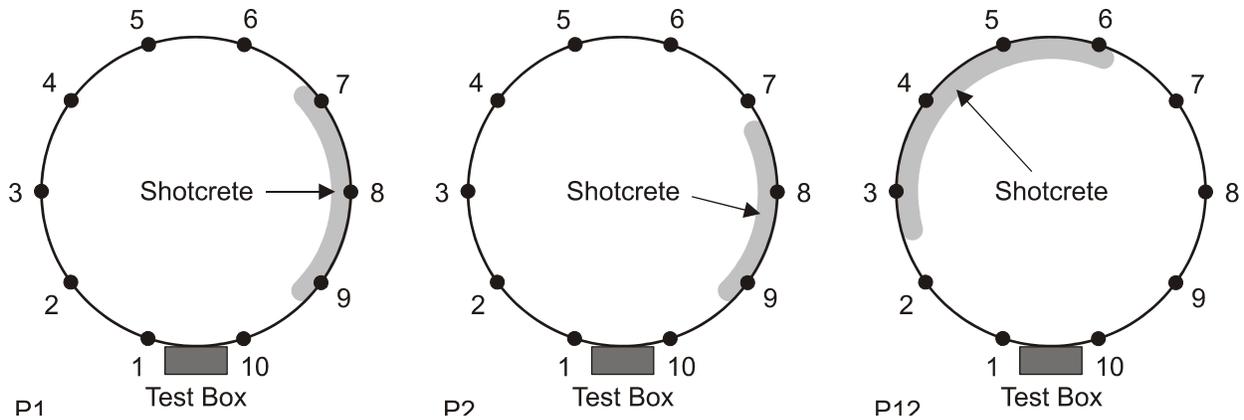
Electrical Test and Shotcrete Repair Locations on Each Column
